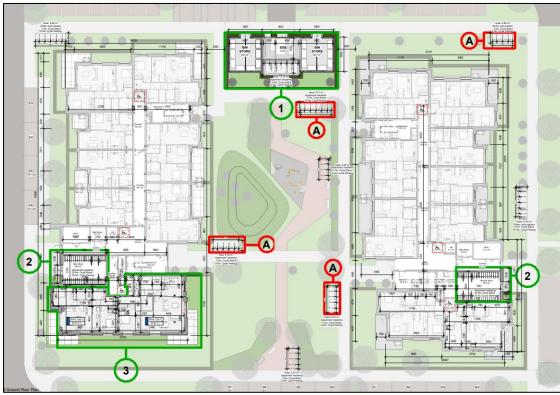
Extract from Dwg. No. GPL-02-AB-L00-DR-RAU-AR-1000 'Permitted and Proposed Apart. Block A & B - Ground Floor Plan' prepared by Reddy Architecture + Urbanism, showing the proposed site layout for Apartment Blocks A and B.
